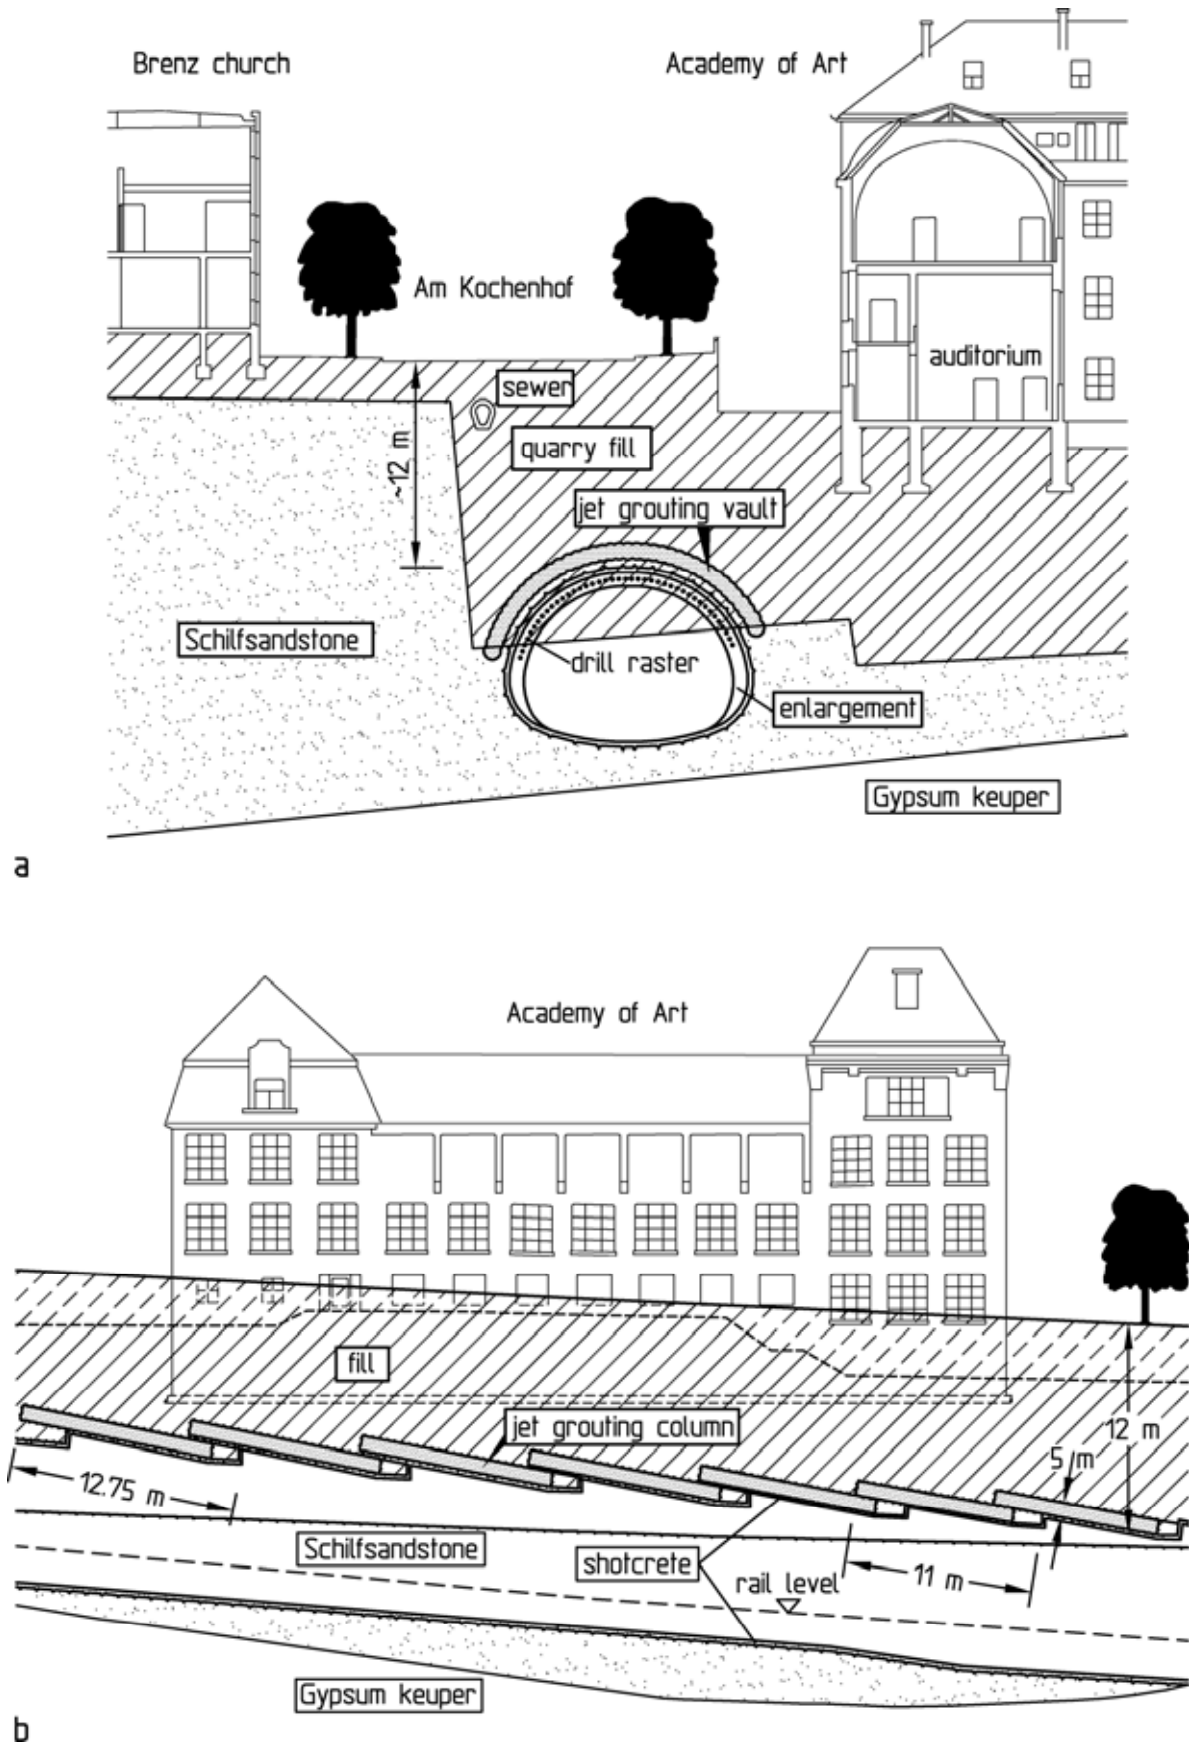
Advance support by jet grouting in the area of the Academy of Art: a) Cross-section; b) longitudinal section
